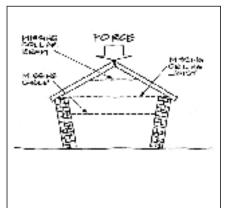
Missing collar ties, ceiling beams, or other framing components stress not only the frame, but also stone walls and foundations
